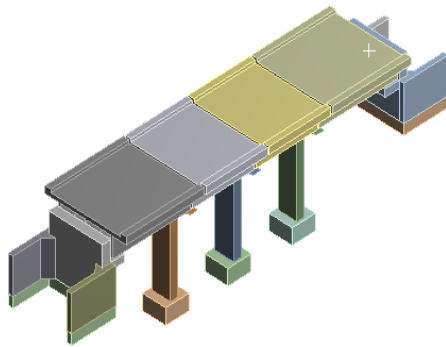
(c): Reinforced concrete girder bridge with cantilever U – wing wall
